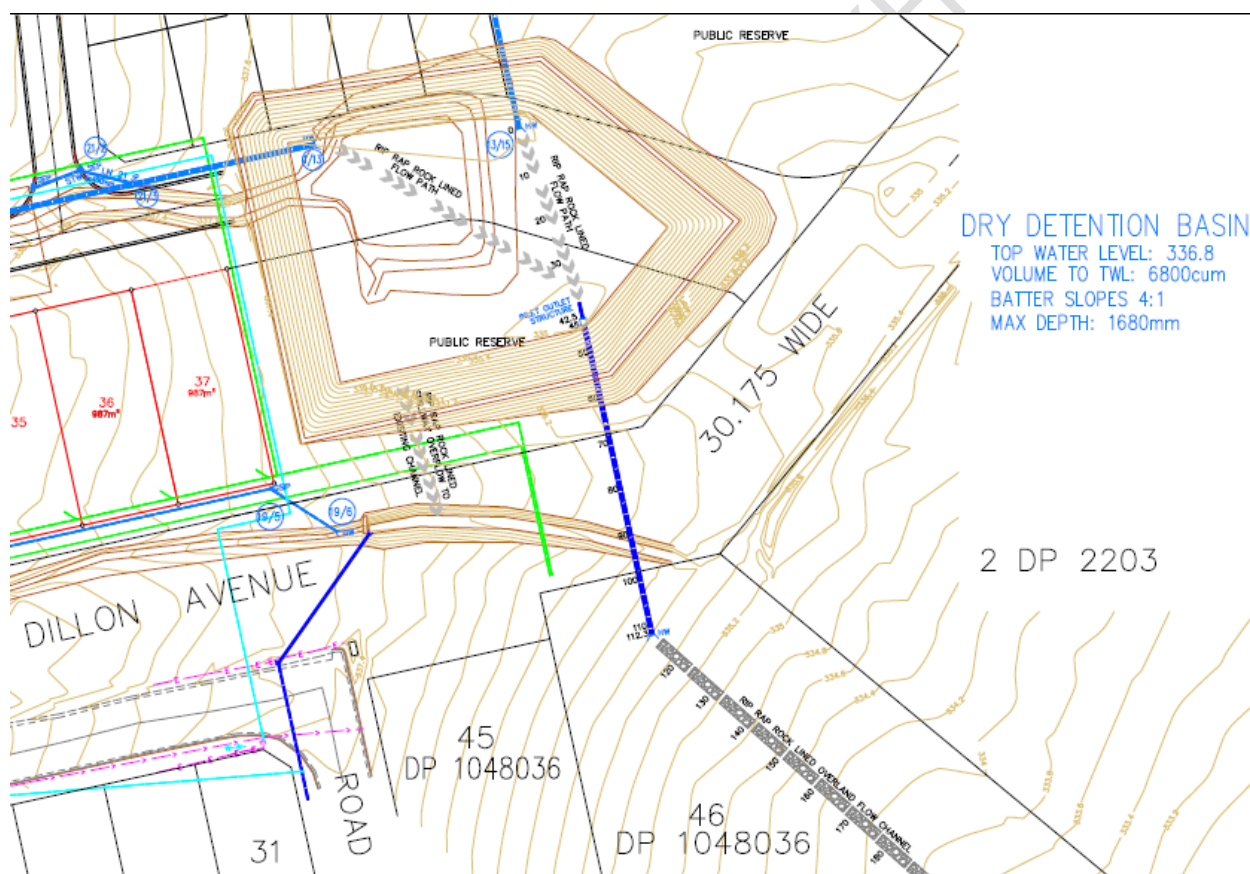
Detention Basin Plan for Boundary Road Subdivision.
